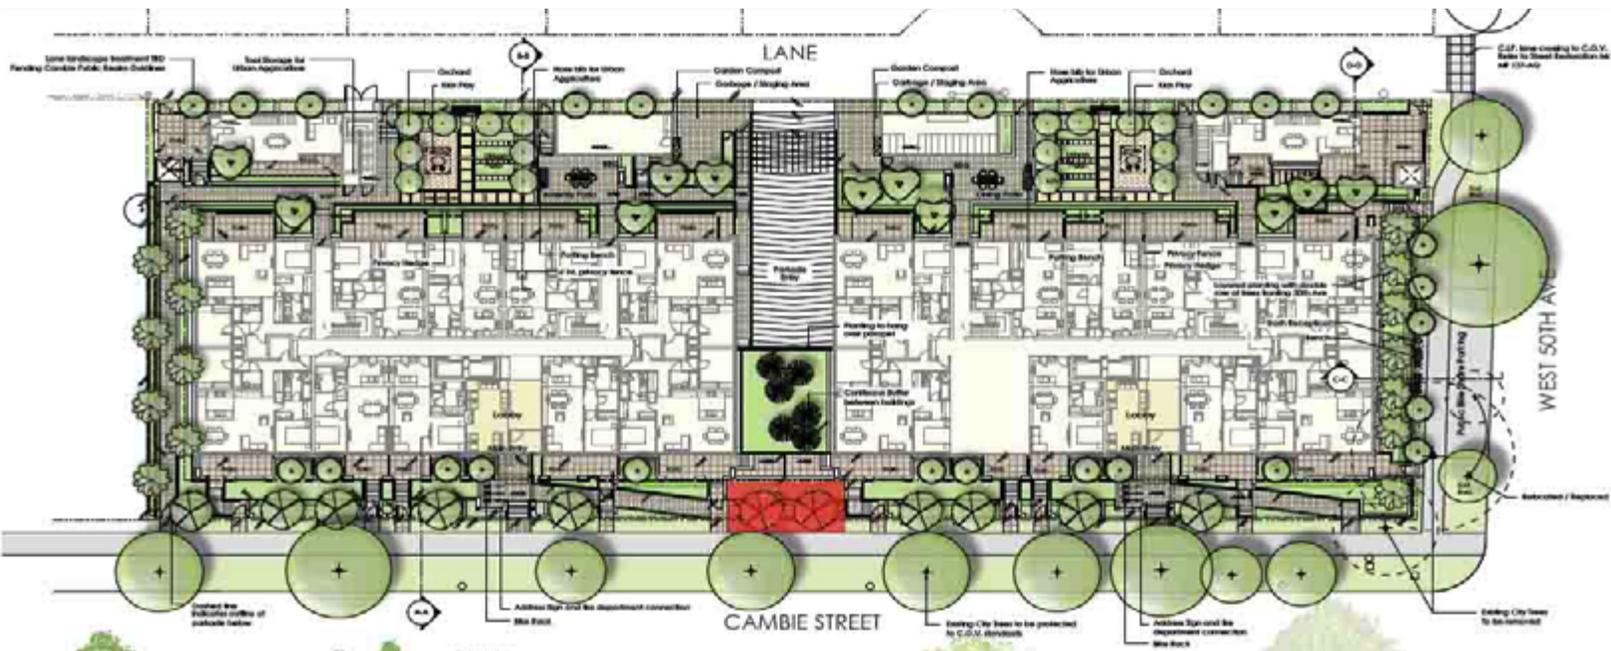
| Public Art Opportunity highlighted in red centered between both residential buildings fronting Cambie Street
